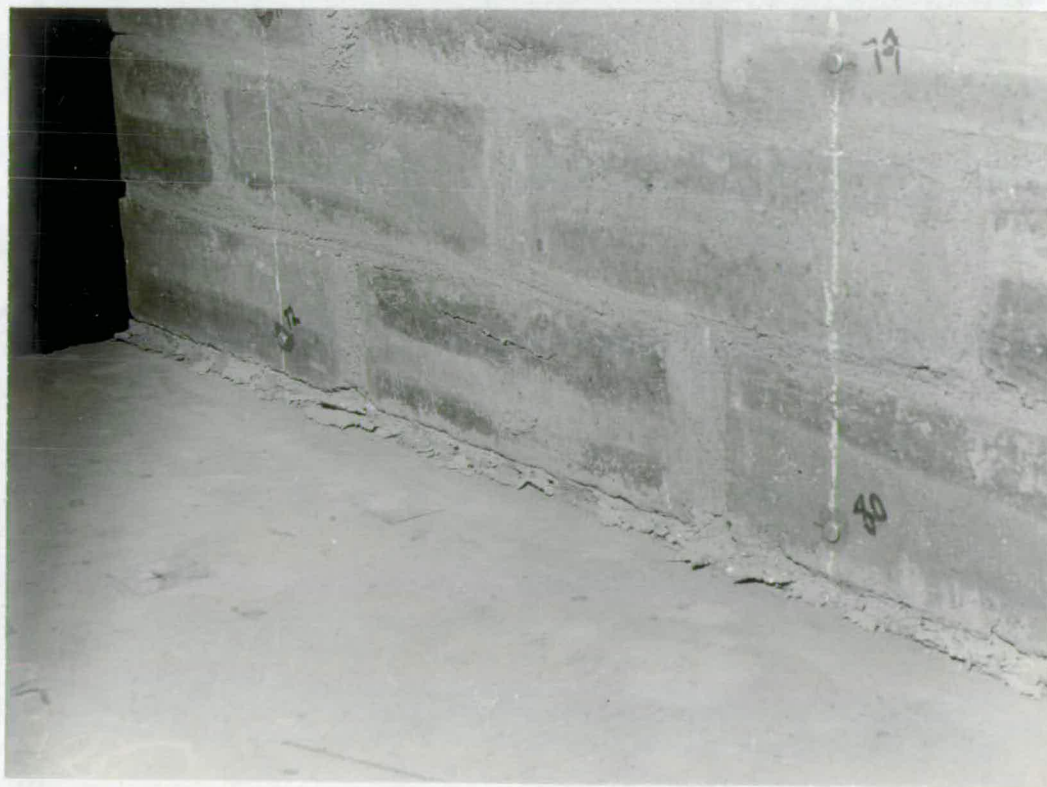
Spalling of the Mortar Joint Adjacent to the Slab .
